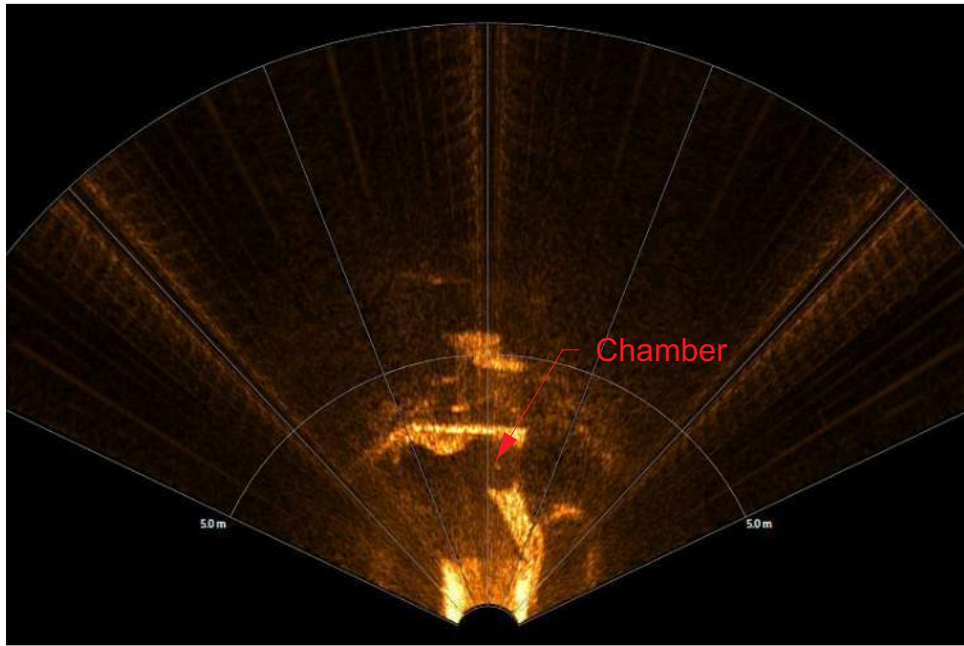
A-9: Sonar image at 190 feet downstream of Manhole 1. Manhole 3 chamber 5 feet ahead.
